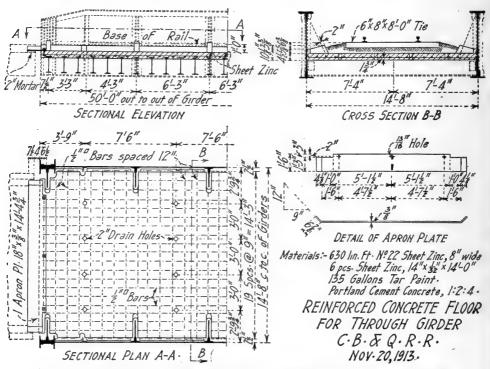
Reinforced Concrete Floor for Through Plate Girder Bridge, C. B. & Q. R. R.
